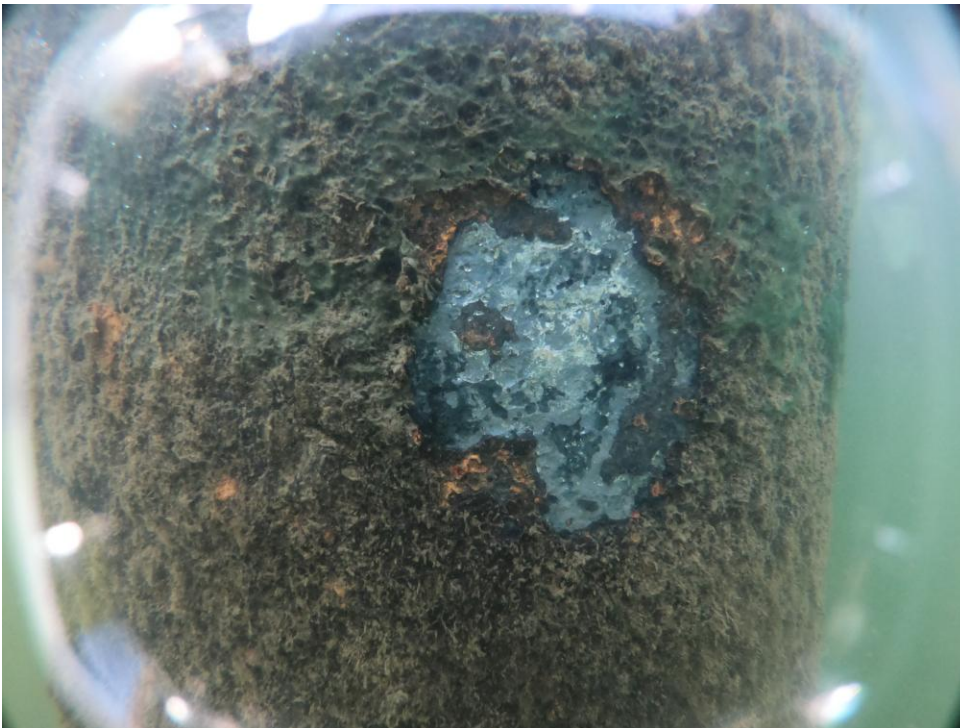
Typical cleaned section of steel pile at water surface elevation.
